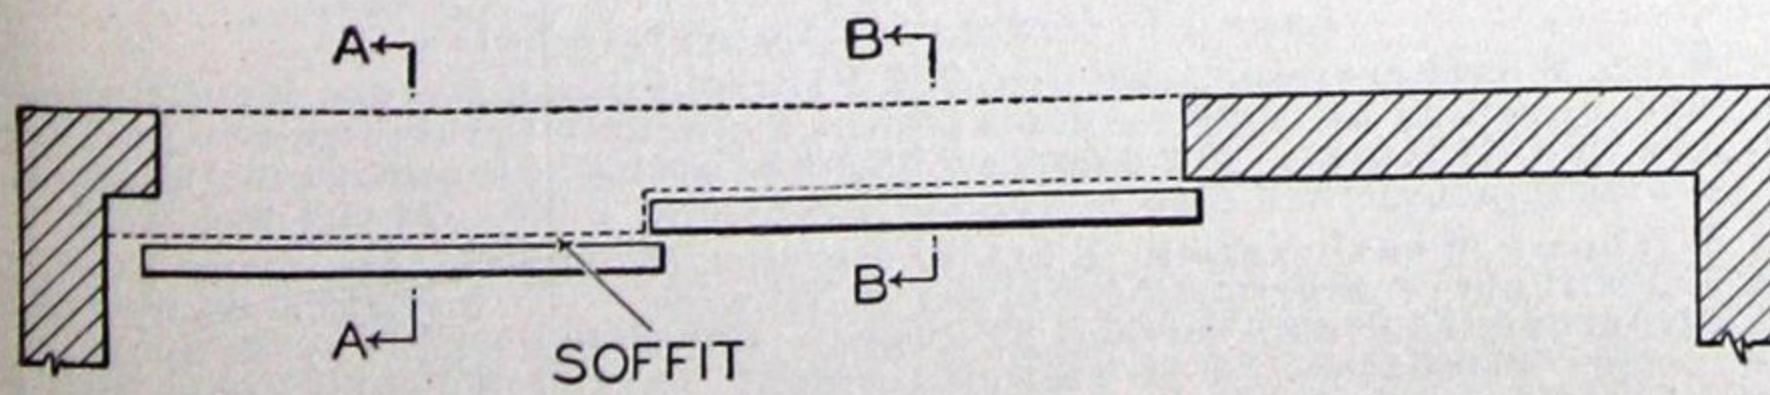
Plan showing how head jamb is built out to meet the door mounted on the track farthest from the wall.
